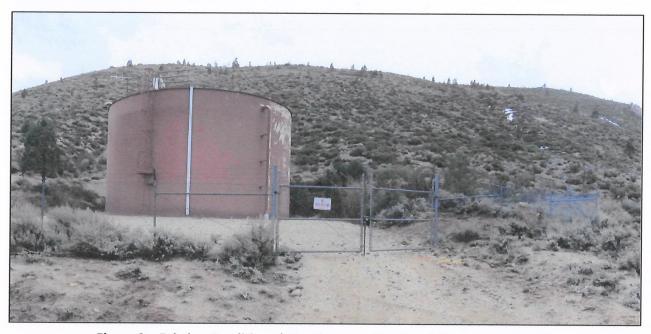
Existing Conditions (Site Photo Looking South from Access Road)
